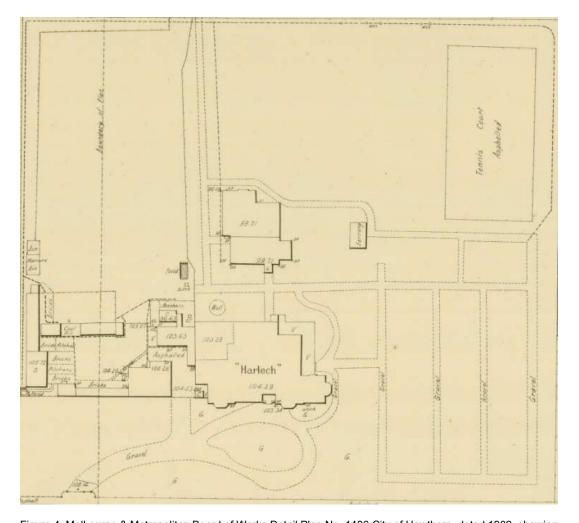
Melbourne & Metropolitan Board of Works Detail Plan No. 1486 City of Hawthorn, dated 1902, showing 'Harlech' set in large grounds with a fernery, tennis court and stable block behind the main house, as well as various outbuildings west of the house. The outline of two bay windows is also visible on the front elevation of the house with a third bay window facing east. (Source: State Library Victoria)
